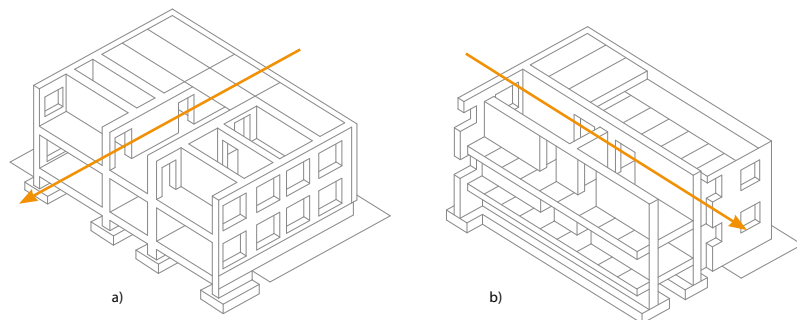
Structural scheme of frameless buildings with bearing walls: a - longitudinal, b - transversal (based on [28])
